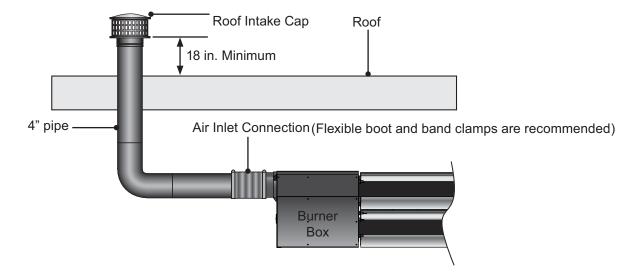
• Horizontal Outside Air Supply for Single Heater Intake • Side View
